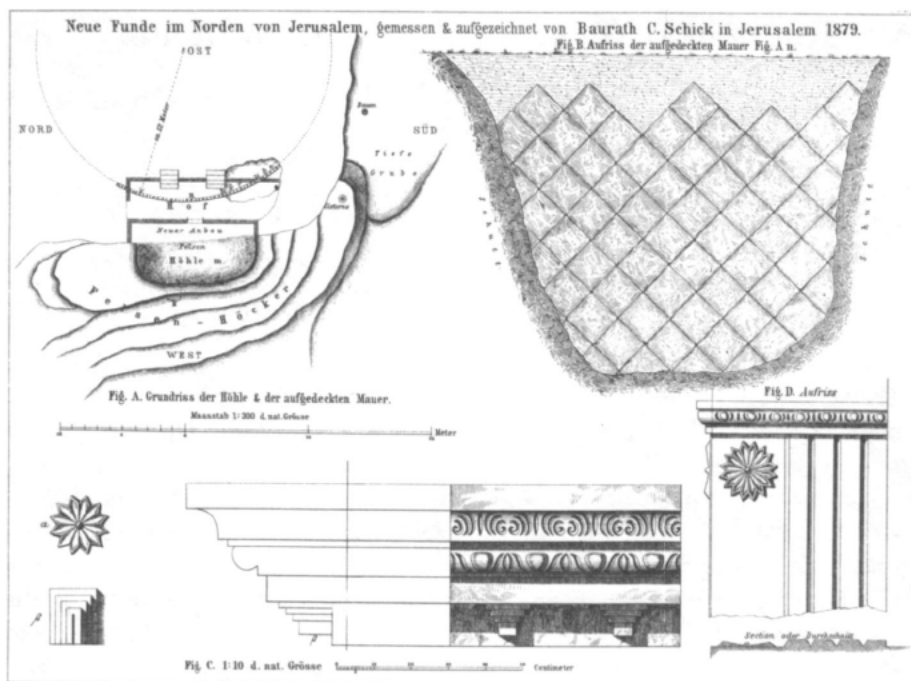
Plan (A), detail of opus reticulatum wall (B) and architectural fragments (C-D) from Schick's excavations in 1879 (from *ZDPV* 2 [1879], Pl. III).
